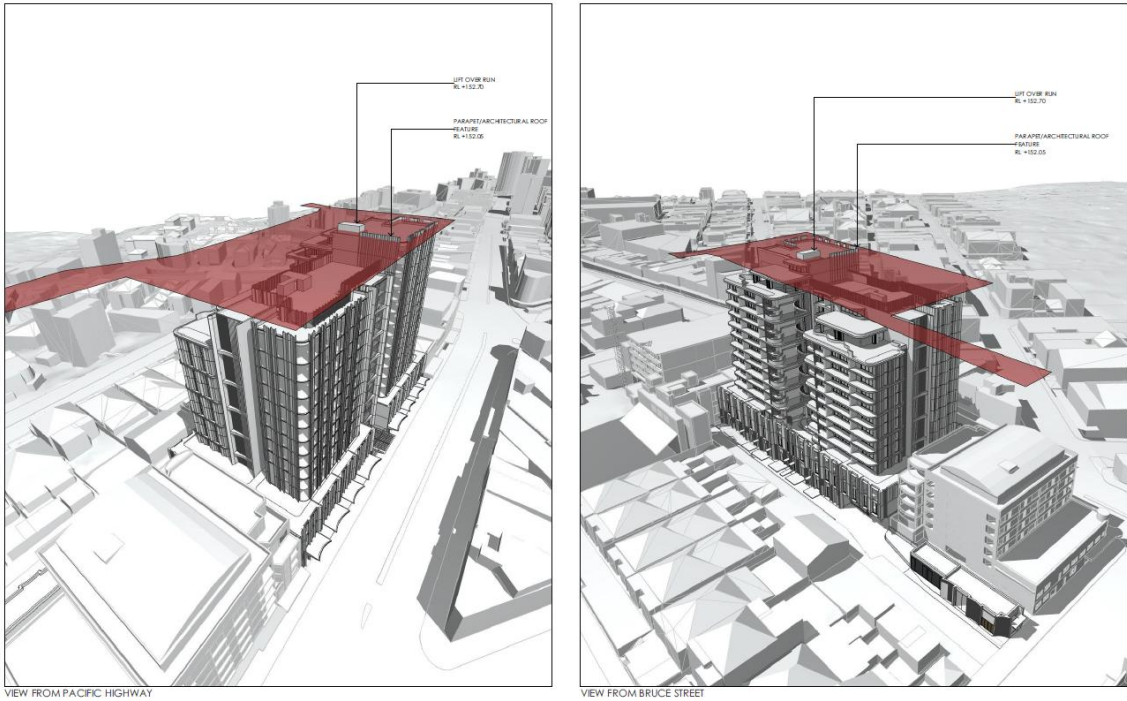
54m height plane (measured from ground level existing) as viewed from Pacific Highway (Source: Fitzpatrick + Partners)
